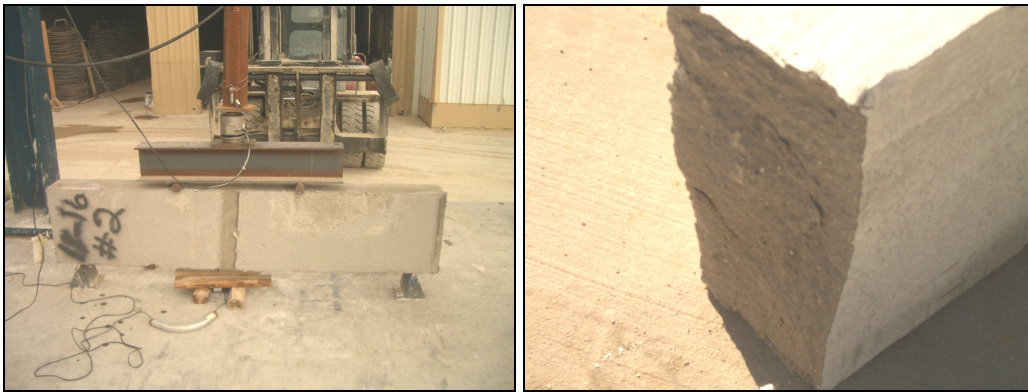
Beam for 2<sup>nd</sup> batch concrete cast on 11/16/06 for 3 day test;
